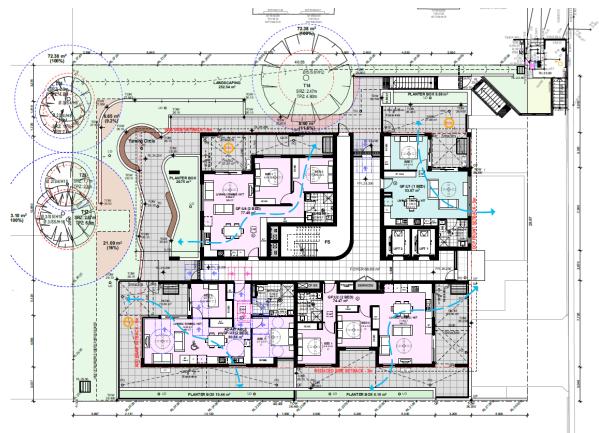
Ground Floor Plan. Source: DTA, [Revision A] dated 26.02.2025
